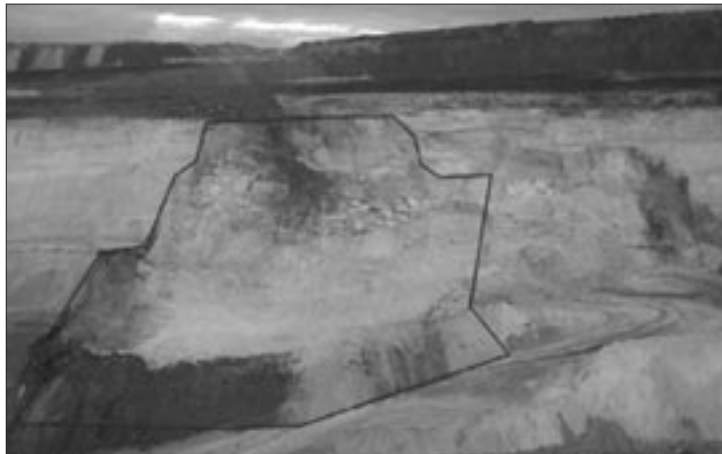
Harmony 1C slip, showing existing failure to the right, with extension outlined
